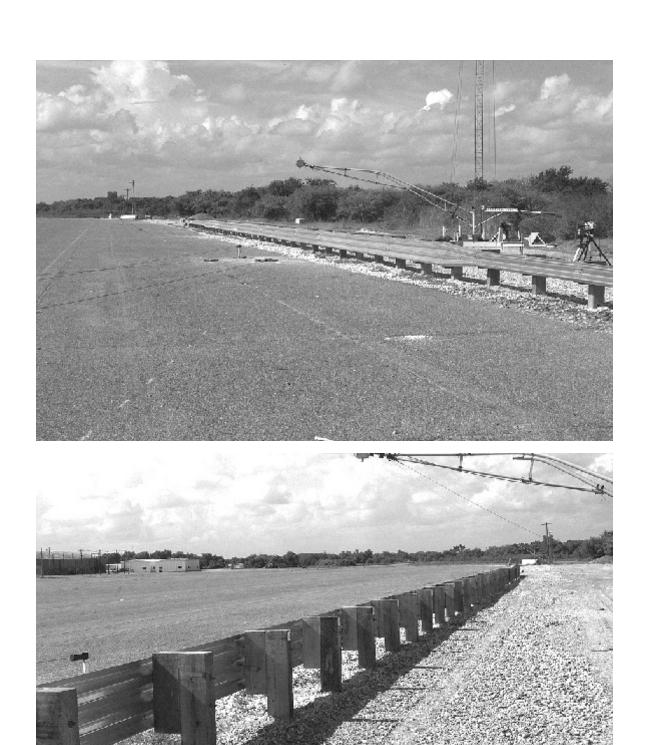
Strong Wood Post Thrie Beam Guardrail installation before test 404211-11.
